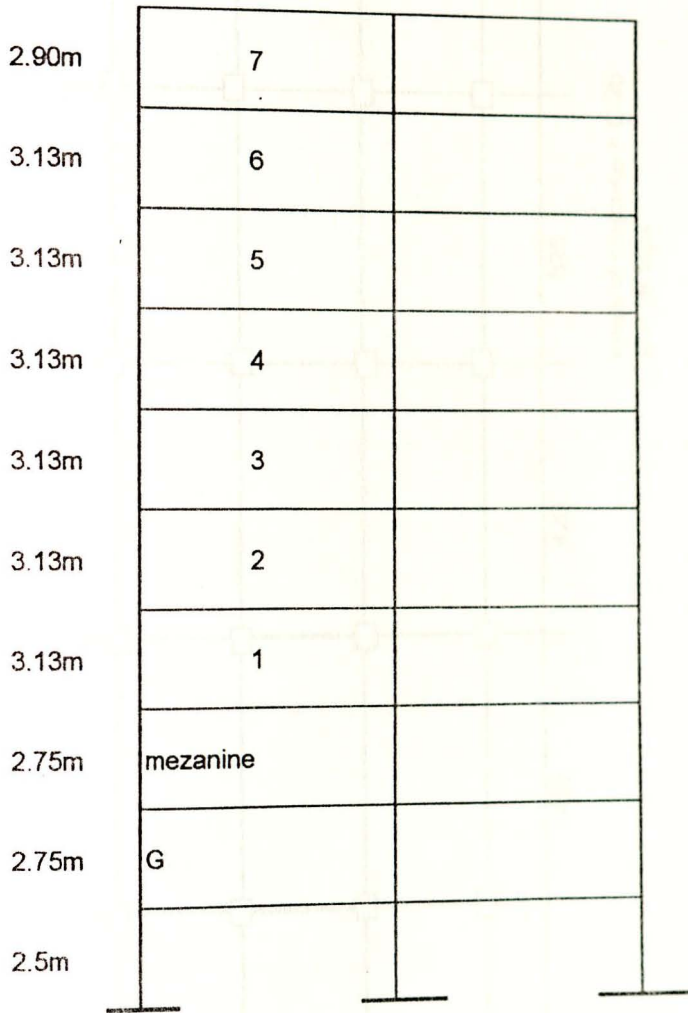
ATO MERGIA G/MARIAM SHOP BUILDING ELEVATION.
